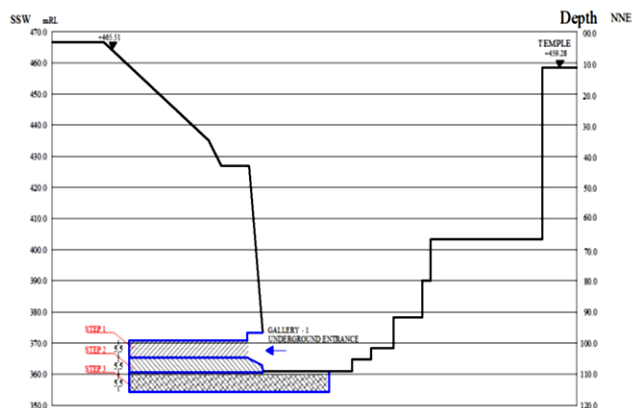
Cross section D1-D2 of the quarry site, highlighting vertical and lateral geometry.
